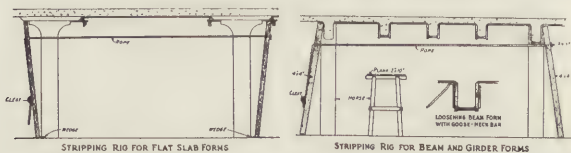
Stripping Details—Methods for stripping flat-slab and beam-and-girder forms.
